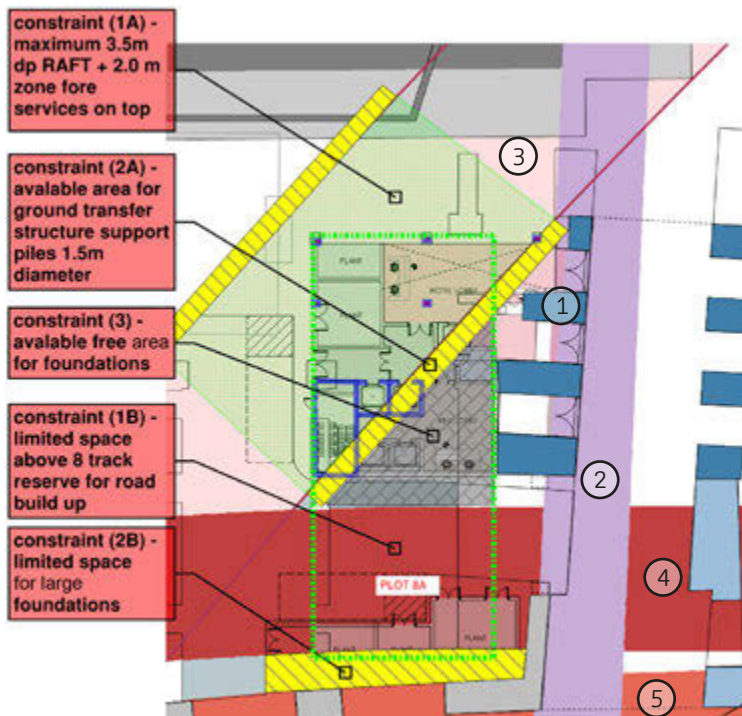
Plot 8A Structural Design Constraints Plan
